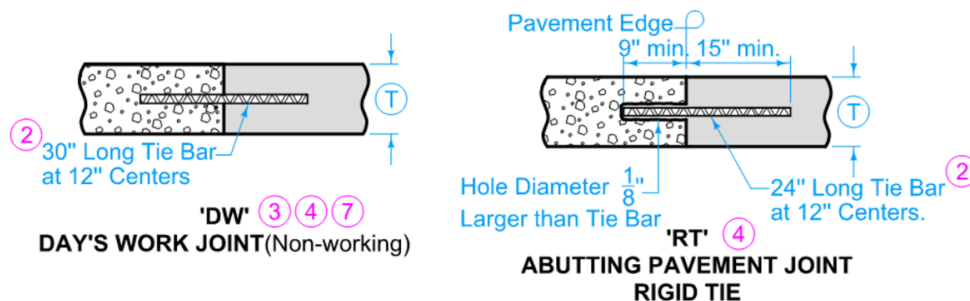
Schematics showing DW and RT joints according to Iowa DOT standards (IowaDOT Standard Road Plans).
